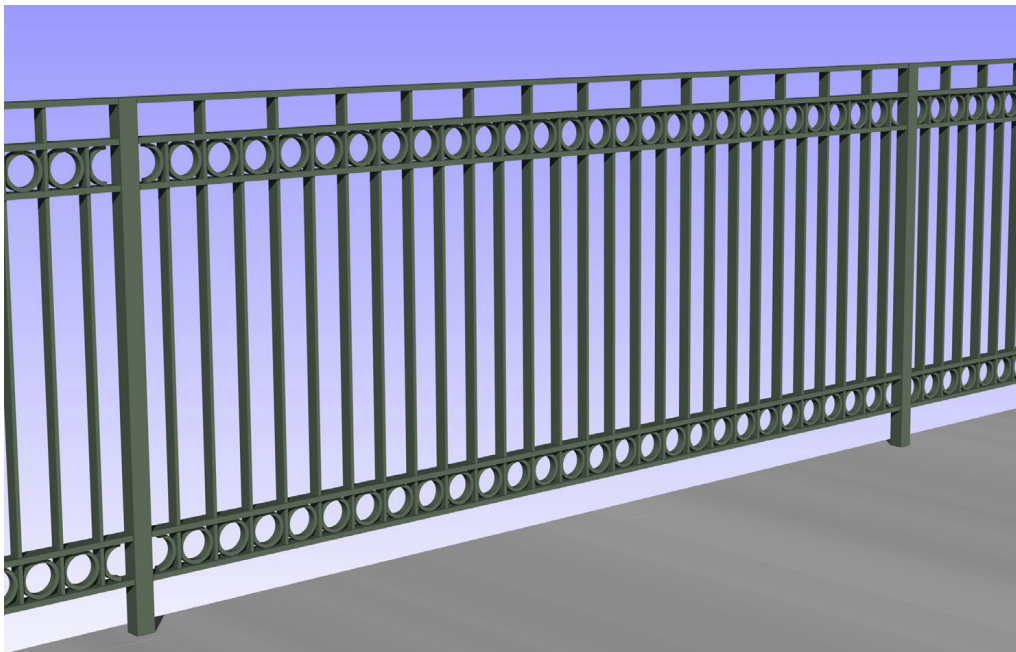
Modified decorative Picket Steel railing
